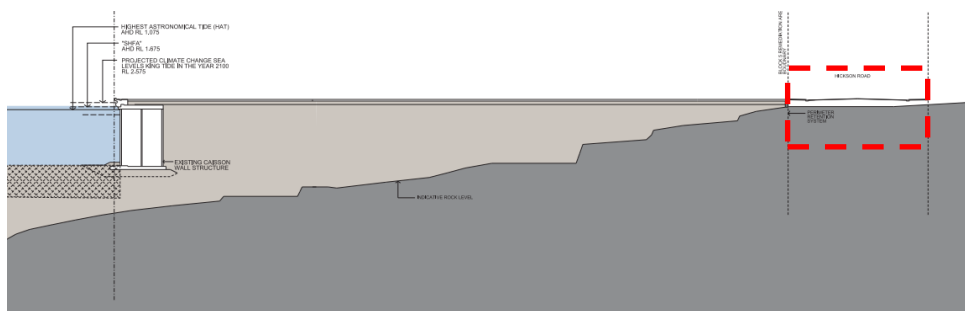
Remediation Area typical section plan (Remediation Area marked in red)
